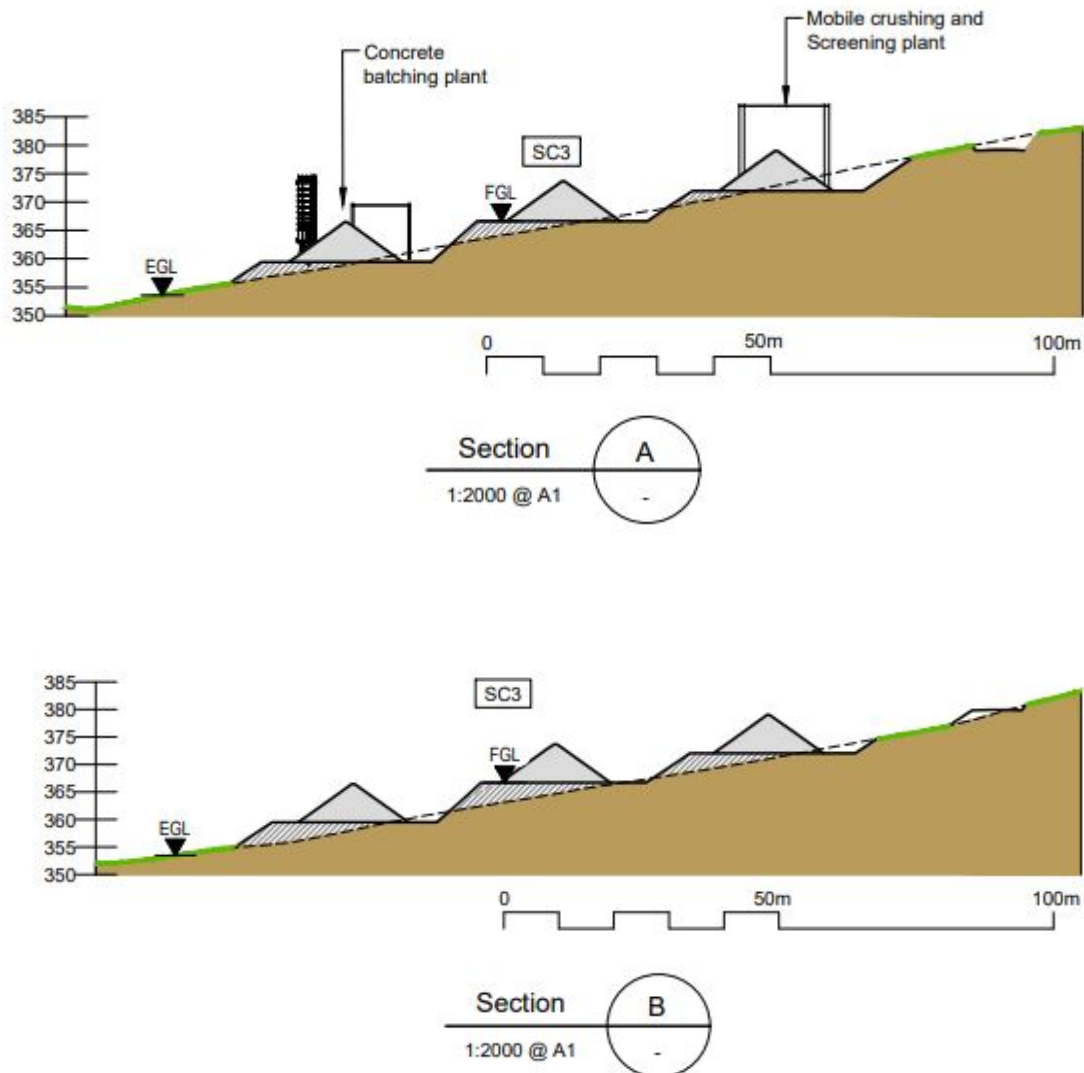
Sections through Site Compound 3 at Powerhouse Area (see Figure 2.32)
